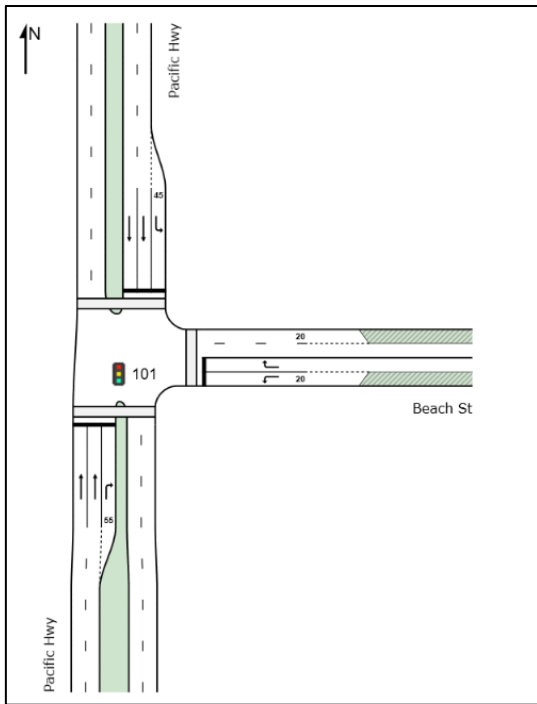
Pacific Highway and Beach Street Intersection Layout
